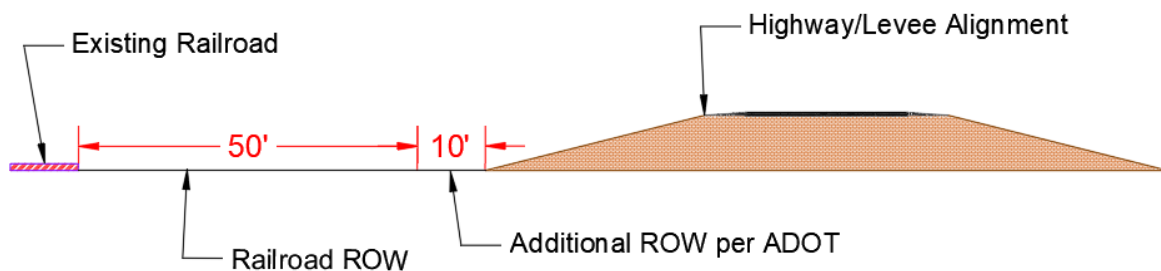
AutoCAD representation of ROW Offset from Railroad to Roadway
